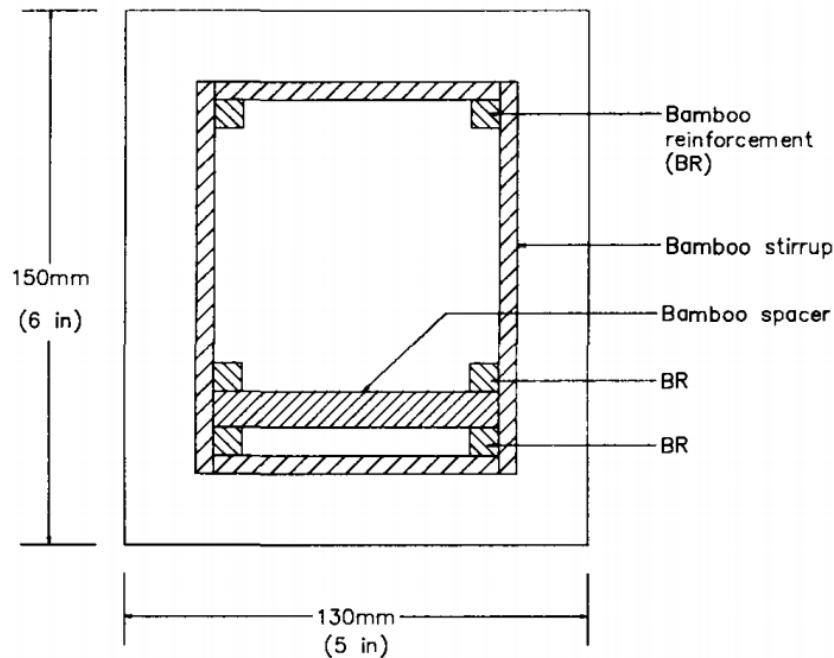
Details of column test specimen in mm (Cook, Pama et al. 1978)
